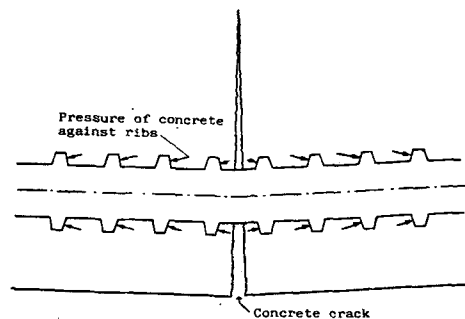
Local curvature peak in reinforcement at concrete crack; transmission of bond stresses through pressure of concrete against transverse ribs of reinforcing bars.
